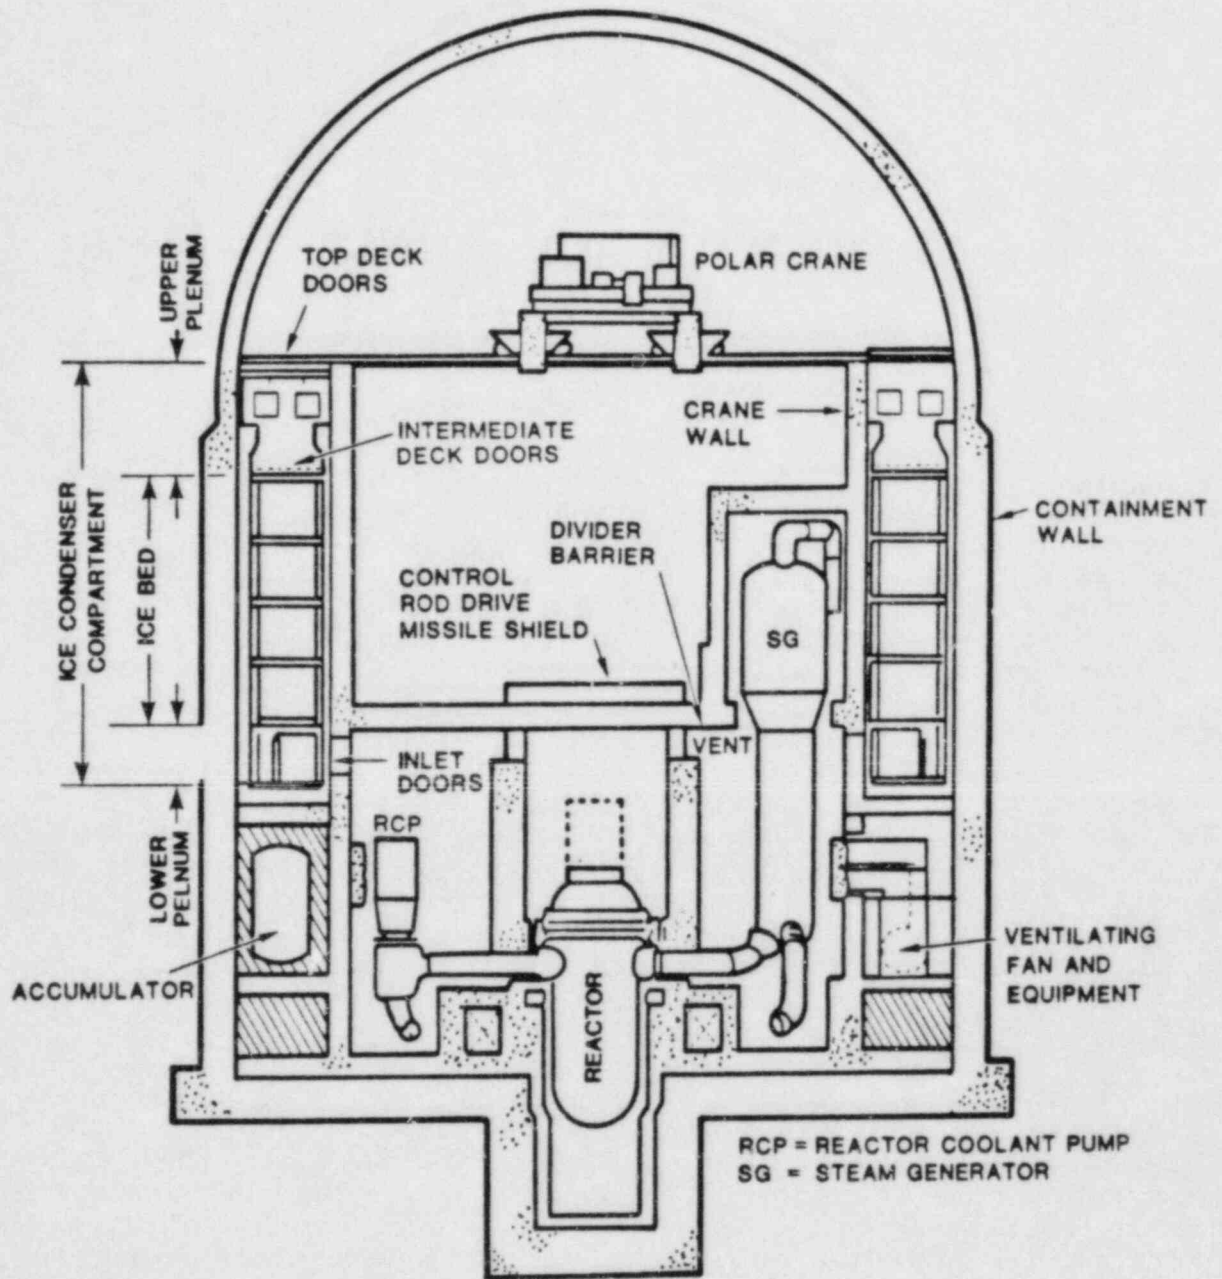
Schematic of Typical Ice Condenser Plant Containment
